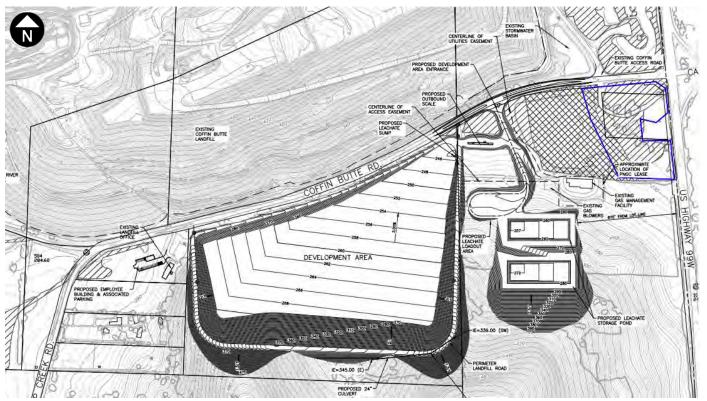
Preliminary Coffin Butte Landfill Development Plan.
